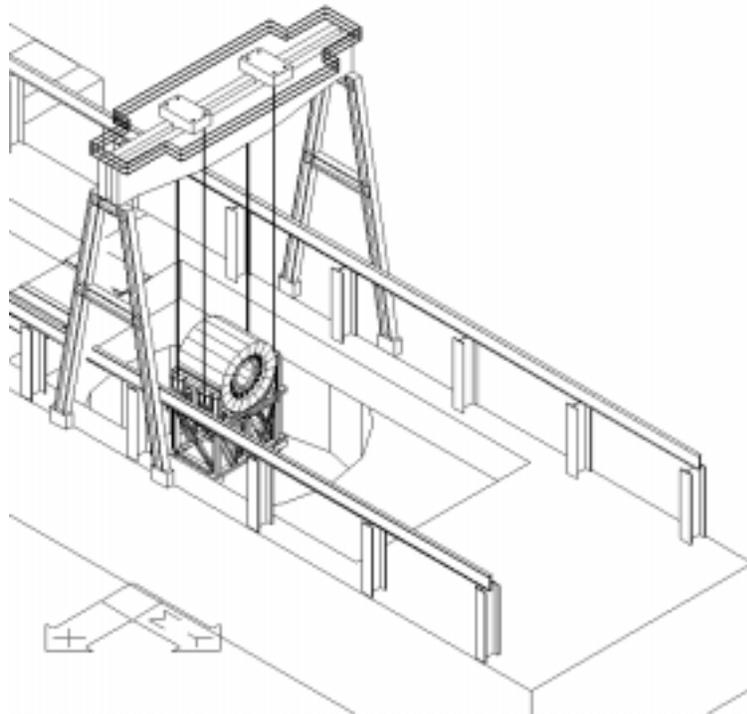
CMS HCAL barrel assembly / installation step 13.
